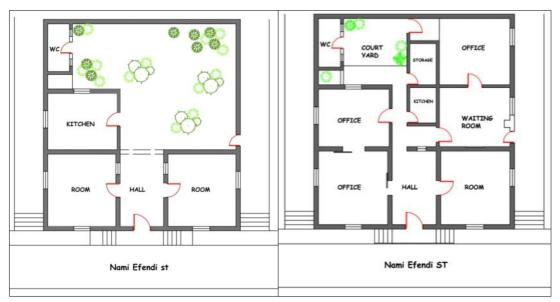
The original and adapted plan of the house (Author, 2012)
